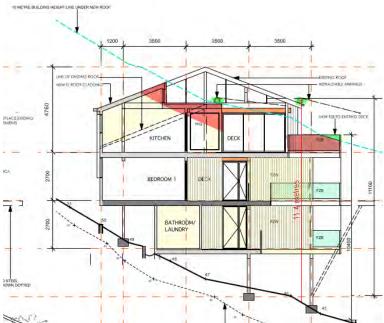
Section Plan demonstrating area of proposed that exceeds the 8.5m height limit (highlighted in pink). Areas of the proposed development which exceed 10m variation highlighted in green.
